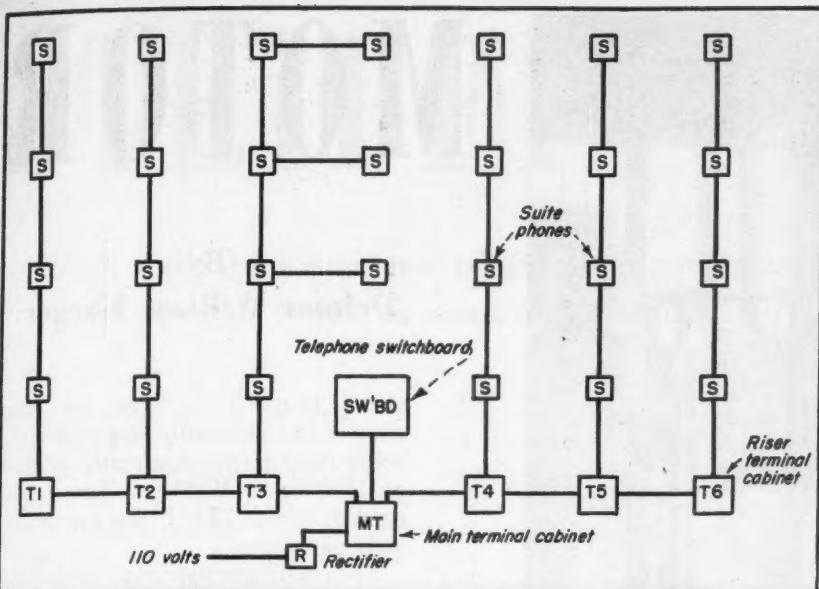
A typical layout contains a main switchboard, terminal cabinets, phones and distribution system.
